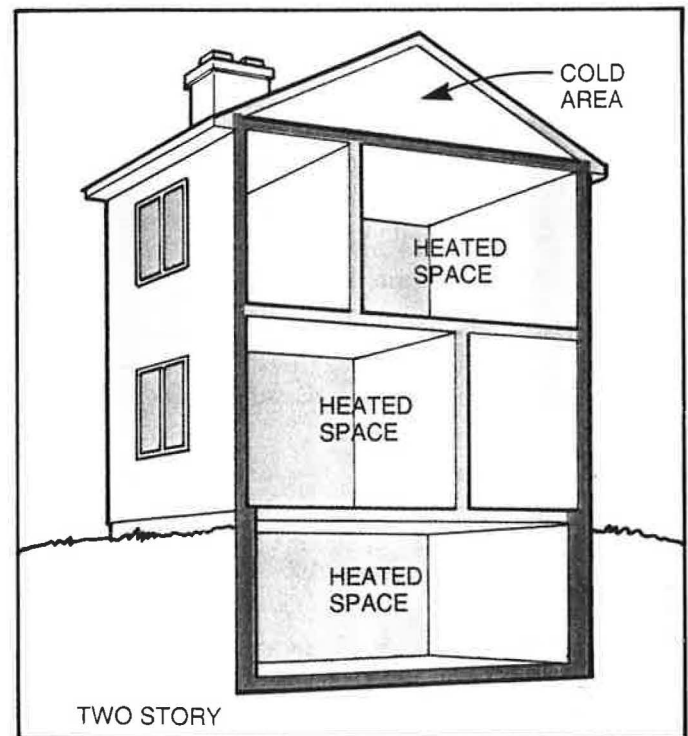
Insulated ceilings and walls that enclose heated space make up the thermal envelope of a house.
